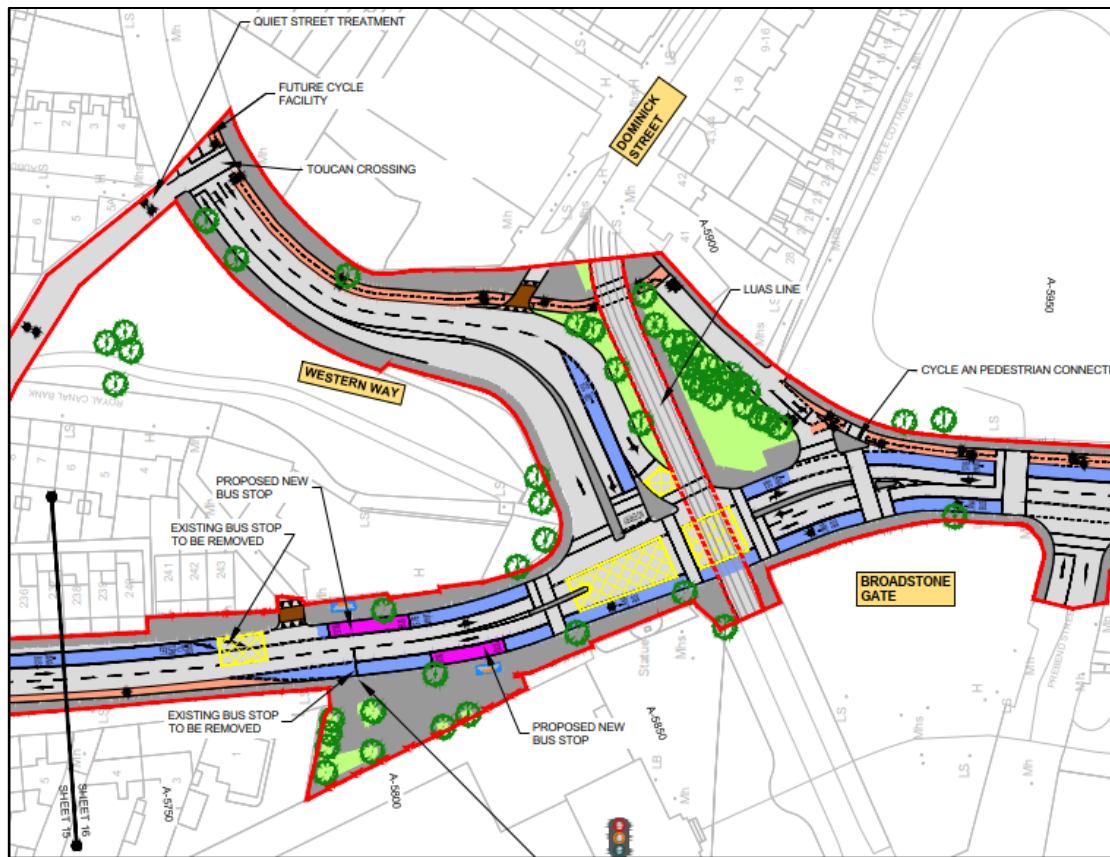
Extract from General Arrangement Drawing Sheet 16
